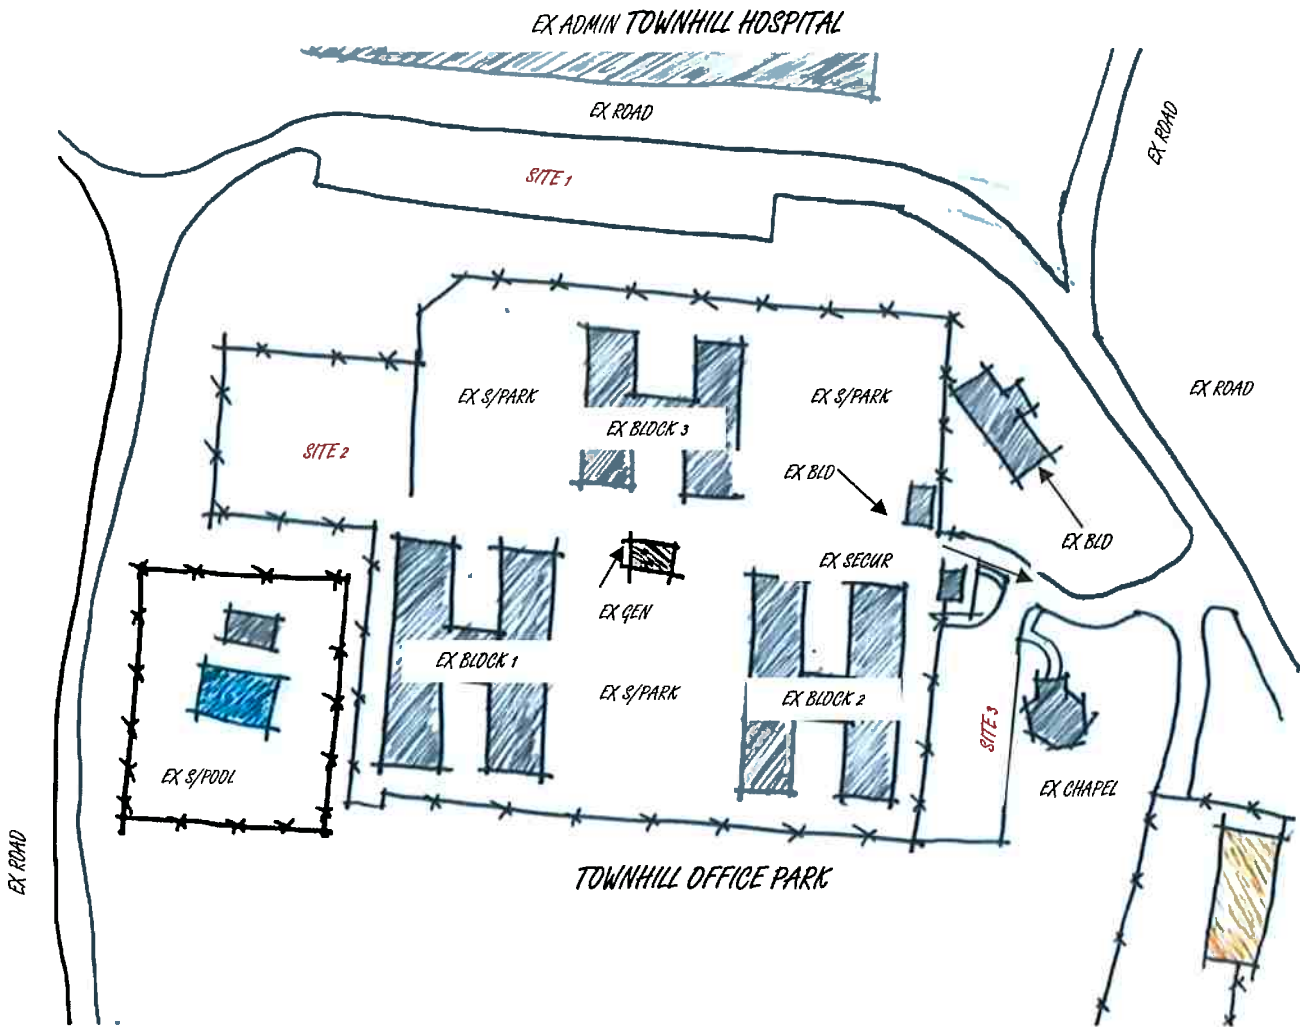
Proposed Site 1, Site 2 and Site 3
